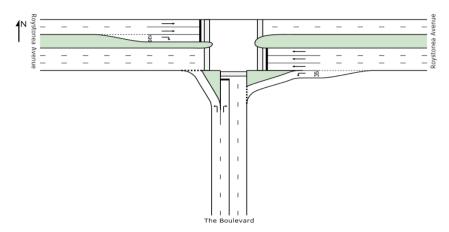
Sidra Model Roystonea Avenue / The Boulevard Intersection
